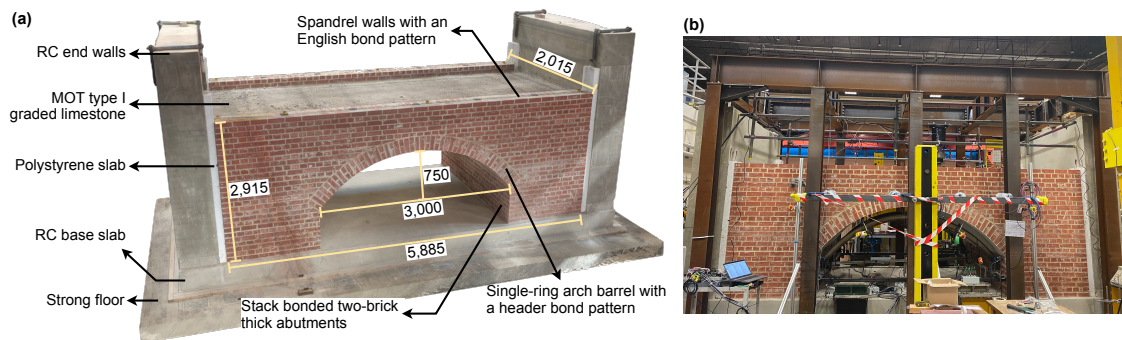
(a) A photogrammetry model for the full-scale masonry arch bridge constructed in the laboratory (all units in mm); (b) testing site.
